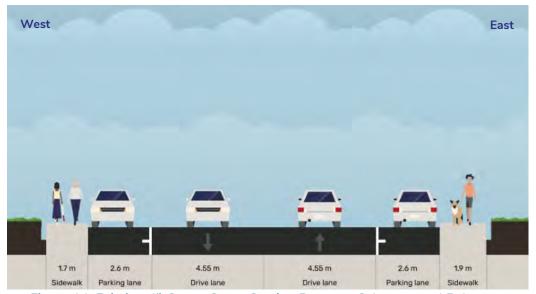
Existing 4th Street Cross-Section Between C Avenue and B Avenue
